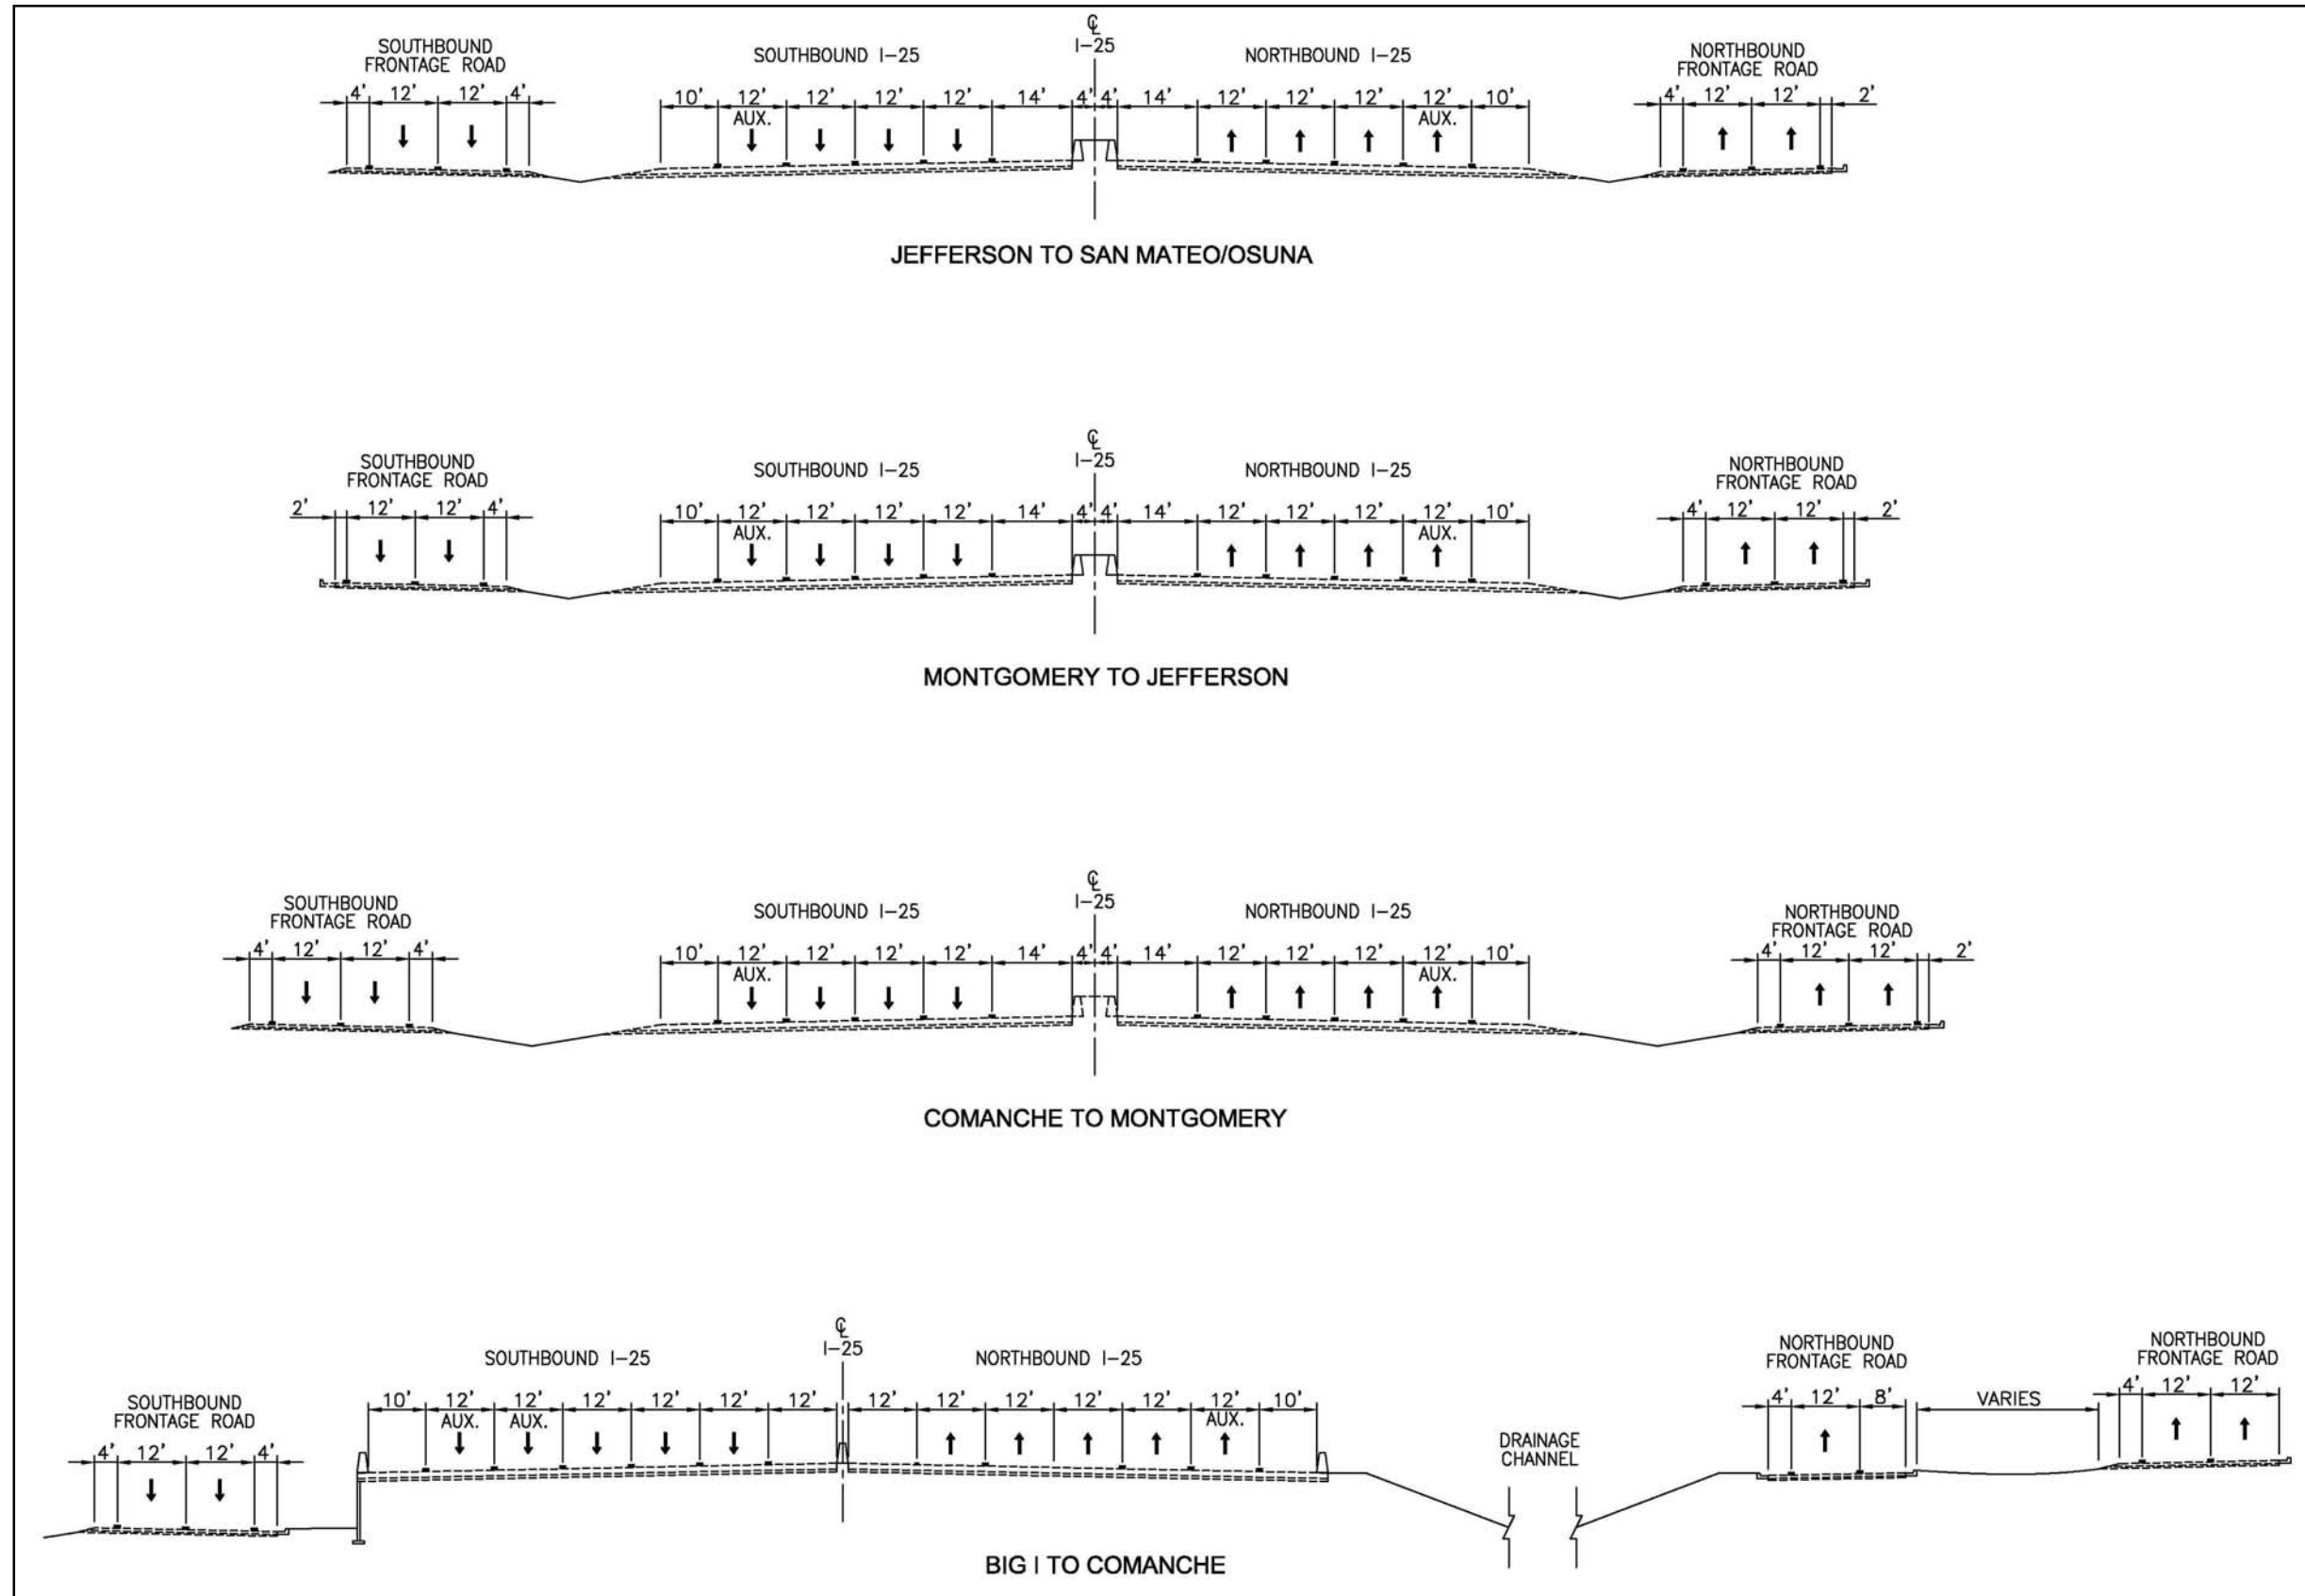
, Existing Condition and No-Build Alternative Typical Sections
